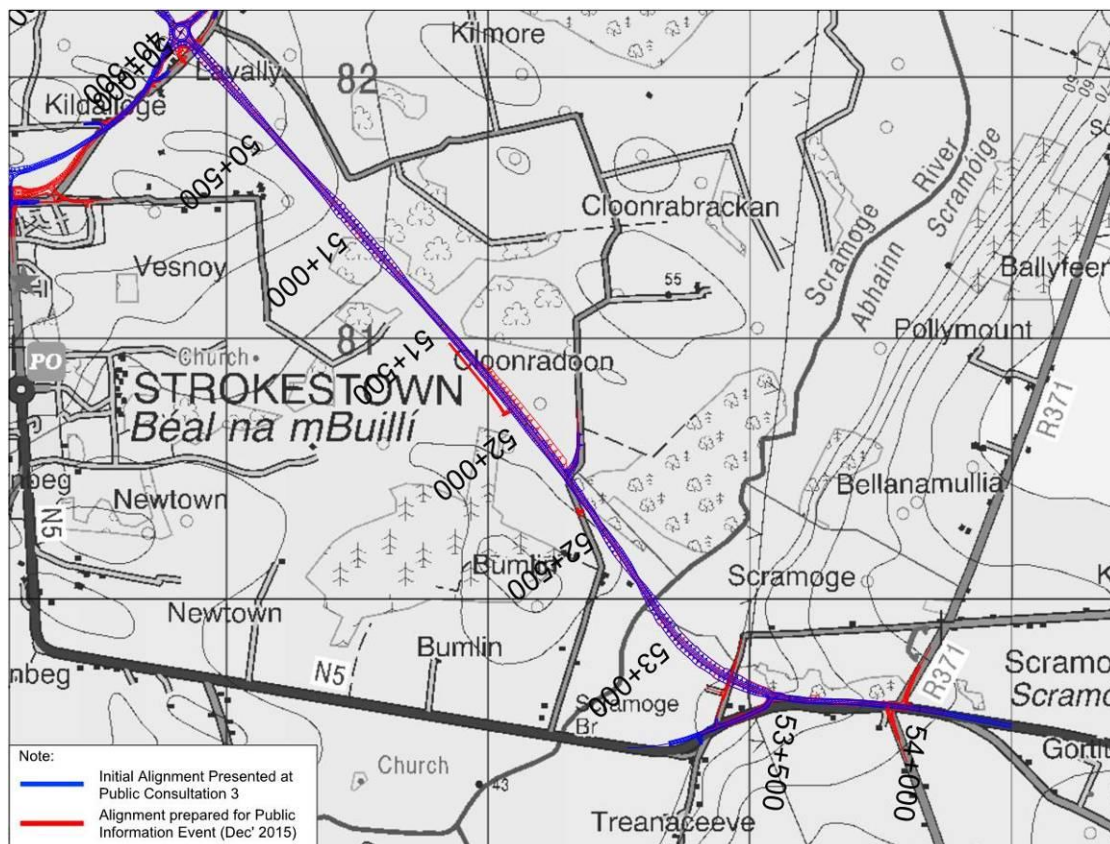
Alignment Development Section D – Ch. 50+000 to Ch. 53+900
